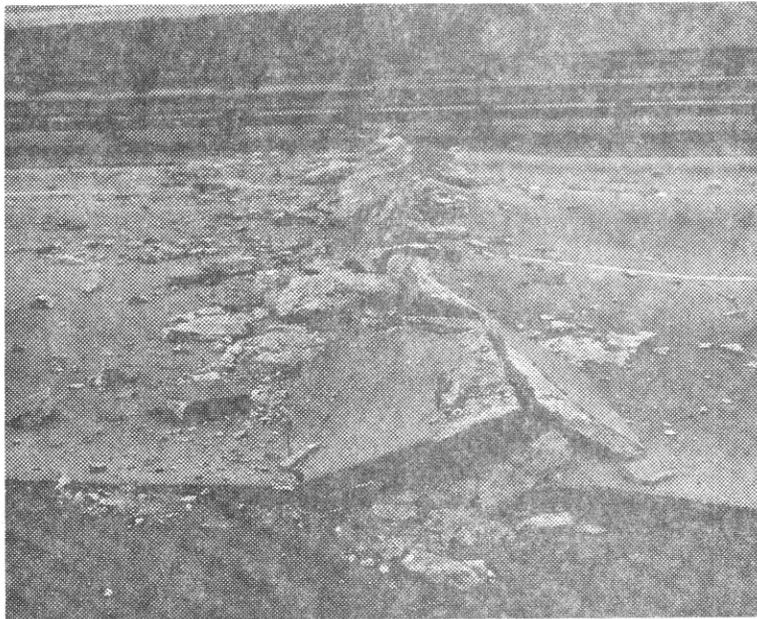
Looking westerly across northbound lanes of Route 405. Pavement break is on a general projection of nearby fault trace mapped by authors.
